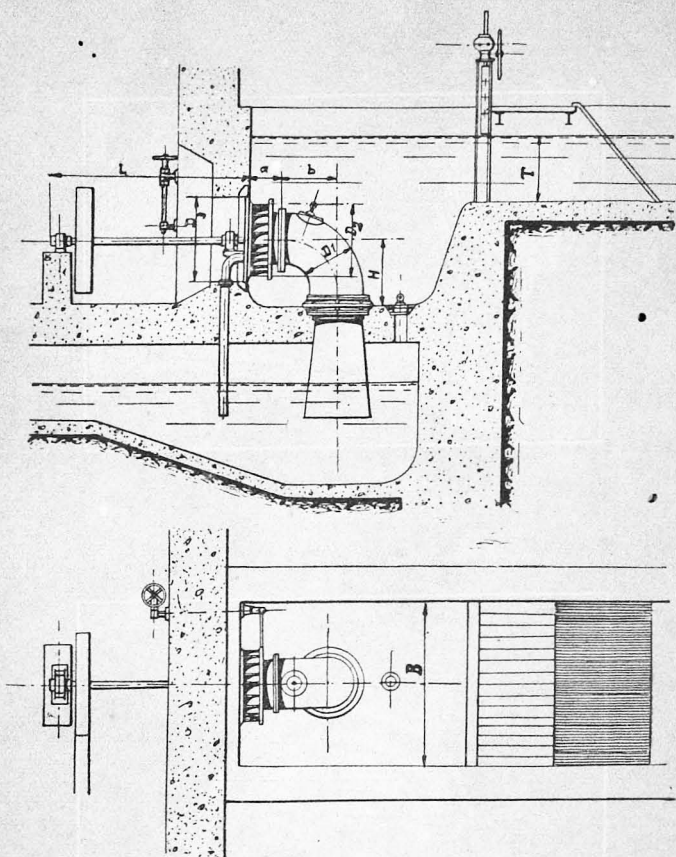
SINGLE FRANCIS TURBINE, WITH HORIZONTAL SHAFT AND IRON SUCTION TUBE.
